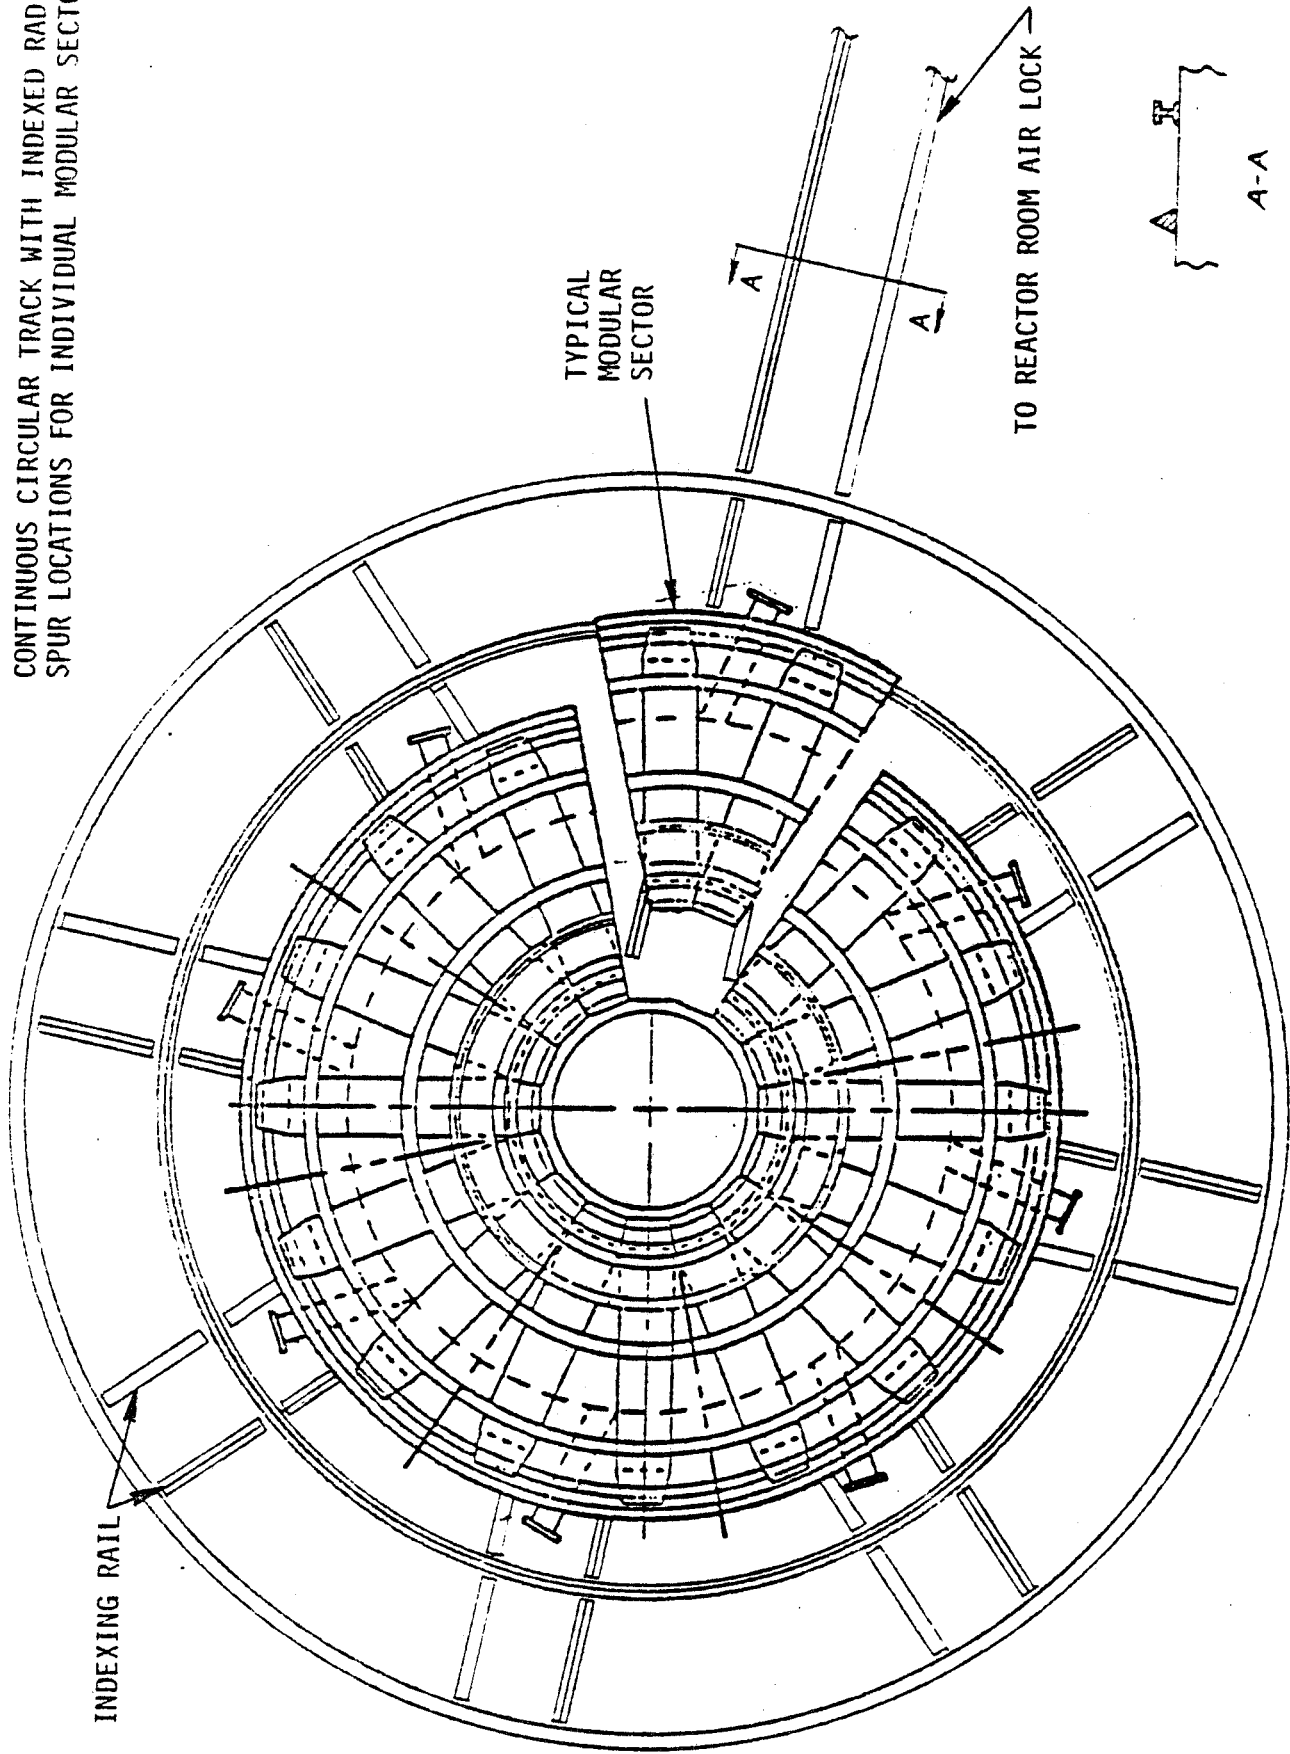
3.2 Plan View Showing Rail System for Mobile Floor Units
